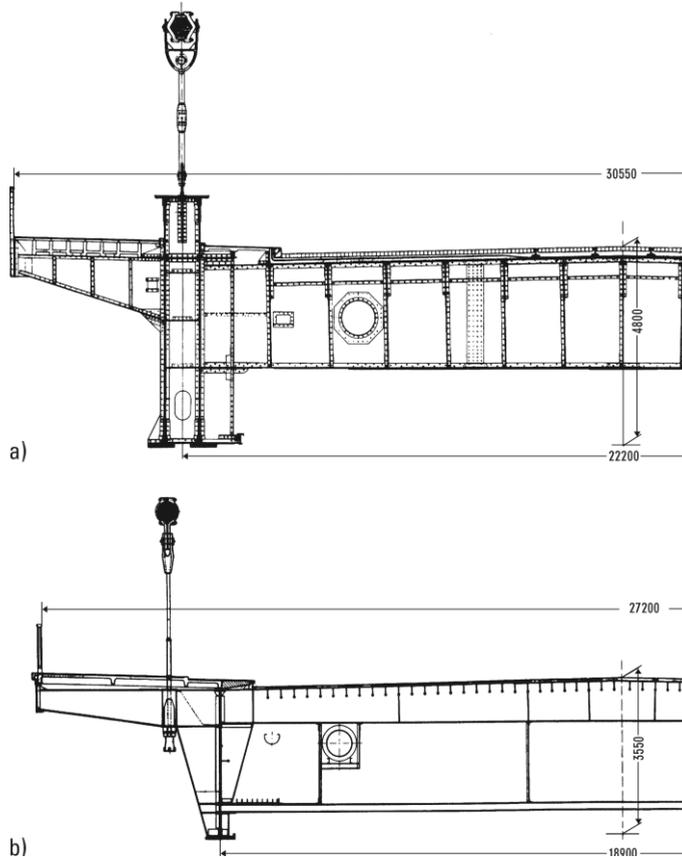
,b. Mülheim suspension road bridge over the river Rhine, of supporting distances 85,0 + 315,0 + 85,0 m; Sections: old-a) and new bridge-b)
